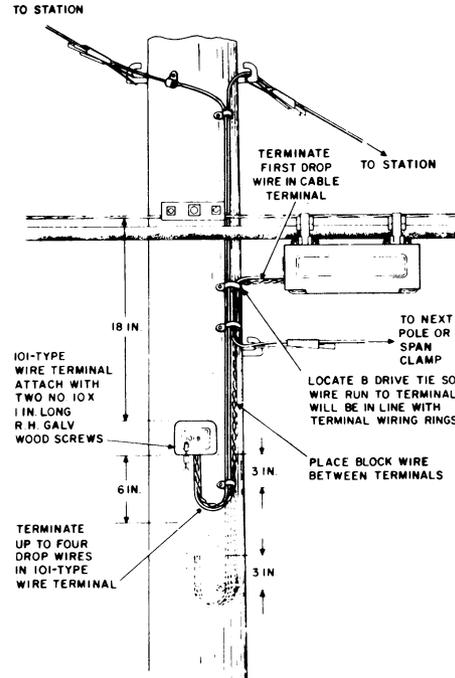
Wiring 101-Type Terminal at Strand-Mounted Cable Terminal
